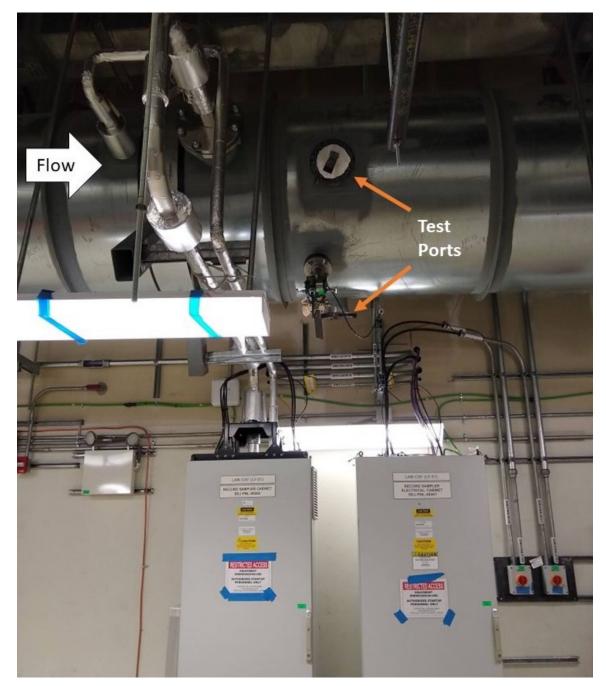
LAW LV-S1 Stack. The stack is positioned along the west wall of the L-0320 Stack Monitoring Room, with one test port slightly below the horizontal centerline, and the second test port slightly west of plumb (behind the probe in the photo). Stack flow is from left (south) to right (north).
